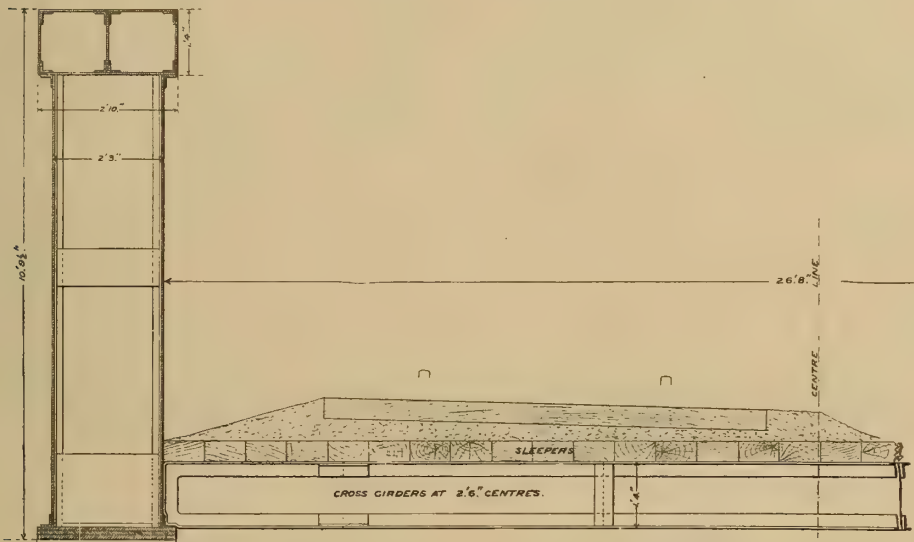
BRIDGE OVER THE RIVER SWALE AT MAUNBY, BUILT FOR THE MELMERBY AND NORTHALLERTON BRANCH OF THE LEEDS NORTHERN RAILWAY IN 1852. ENGINEER, THOS. GRAINGER. (REPLACED WITH A STEEL BRIDGE, 1899, W. J. CUDWORTH, ENGINEER.) WROUGHT IRON BOX GIRDERS 155 FEET LONG, 10 FEET 9 INCHES DEEP
